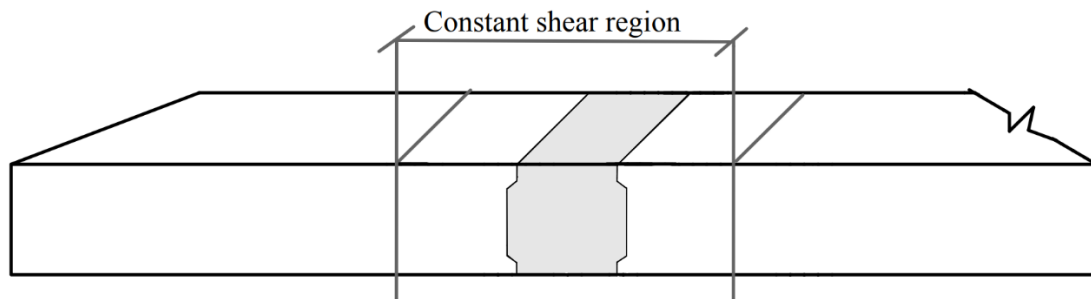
Crack Propagation for Proprietary Long-Term Specimen at 30 % of Final Load
